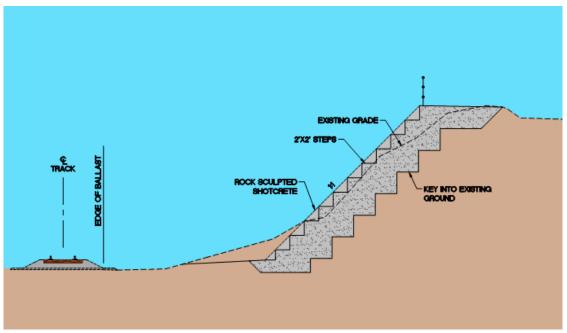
Drainage Area 5 - Cement Slurry Buttress Alternative
